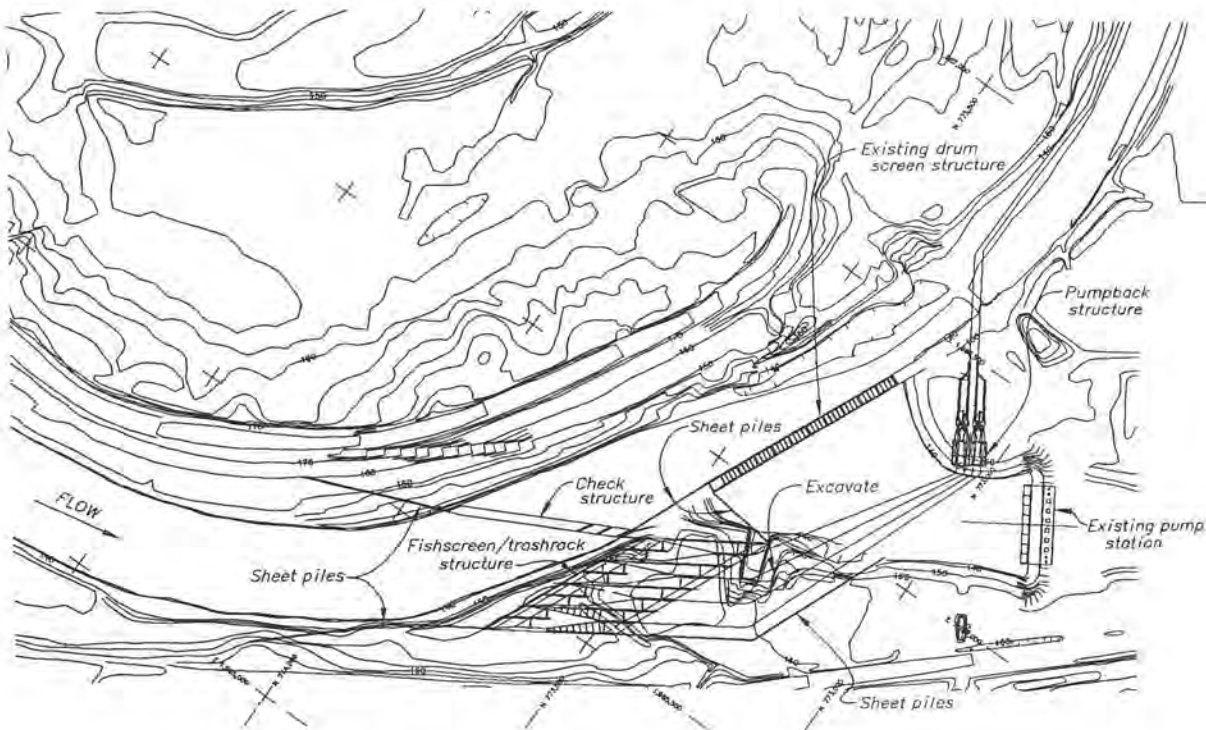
Conceptual layout: Plan view of proposed A alternative.
